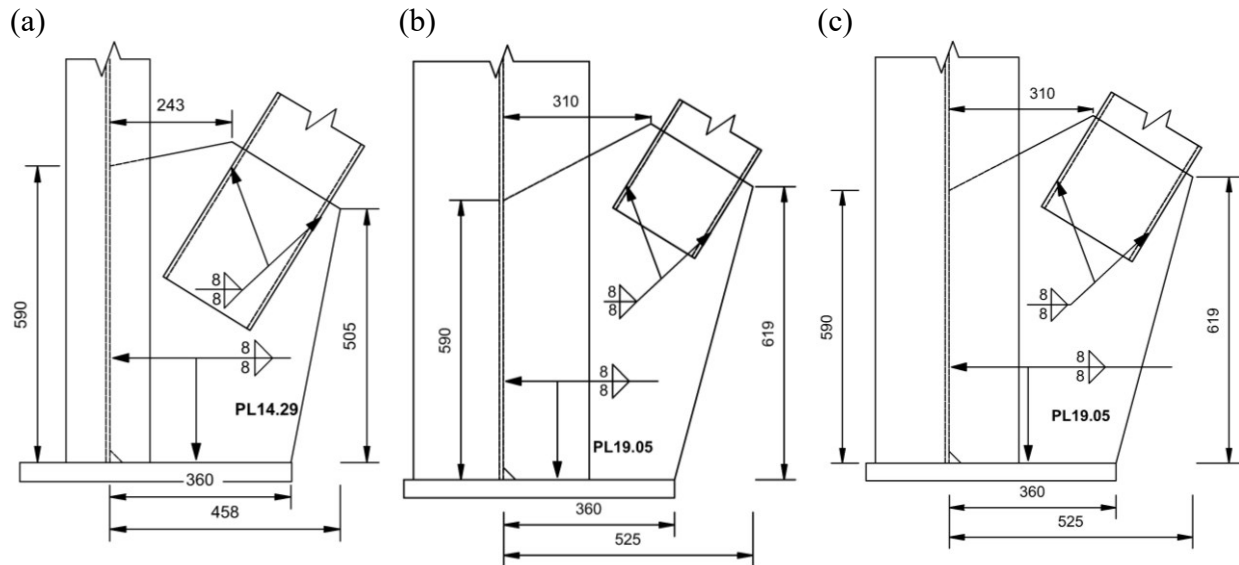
Tier 1 gusset plate dimensions: (a) Specimen 1; (b) Specimen 2; (c) Specimen 3 (dimensions in mm).
